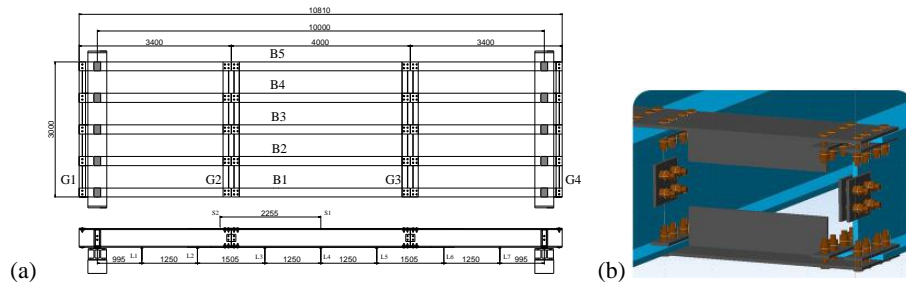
Design results of the 10-m span GFRP composite bridge: (a) design drawings, and (b) connection details
